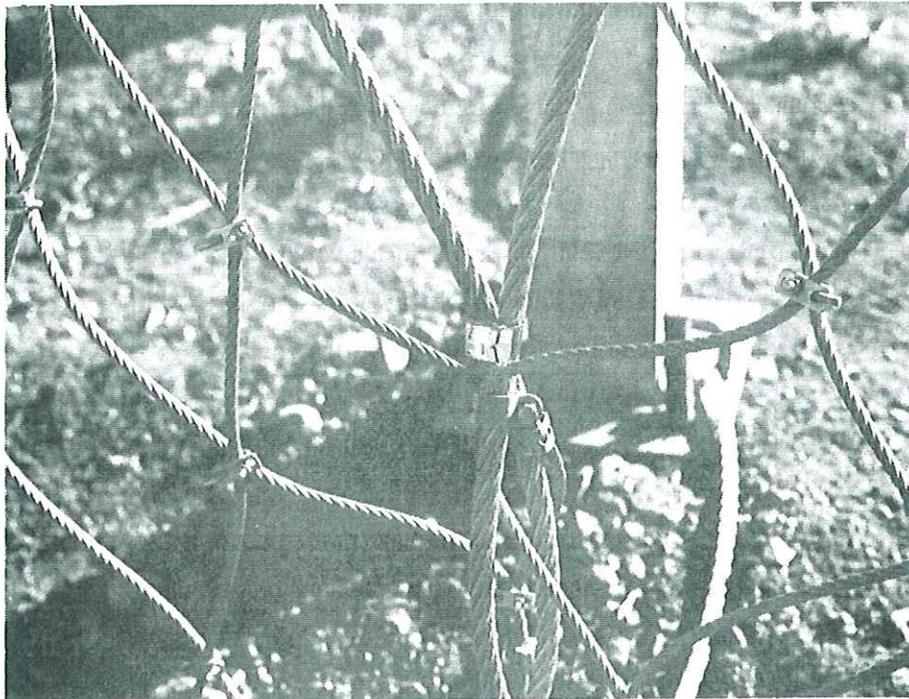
INDUSTRIAL ENTERPRISE STEEL BANDS USED TO JOIN
